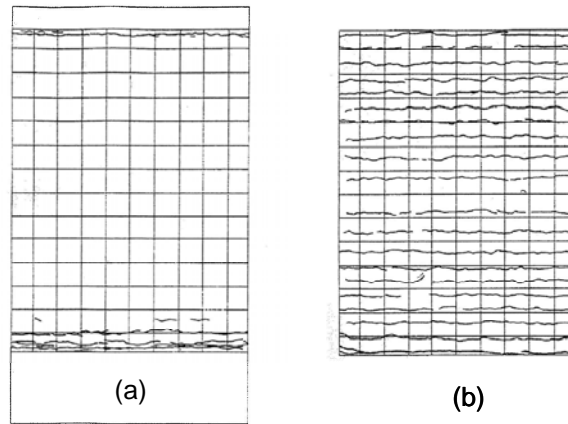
Concrete Cracks (a) Outer and (b) Inner Sidewalls
